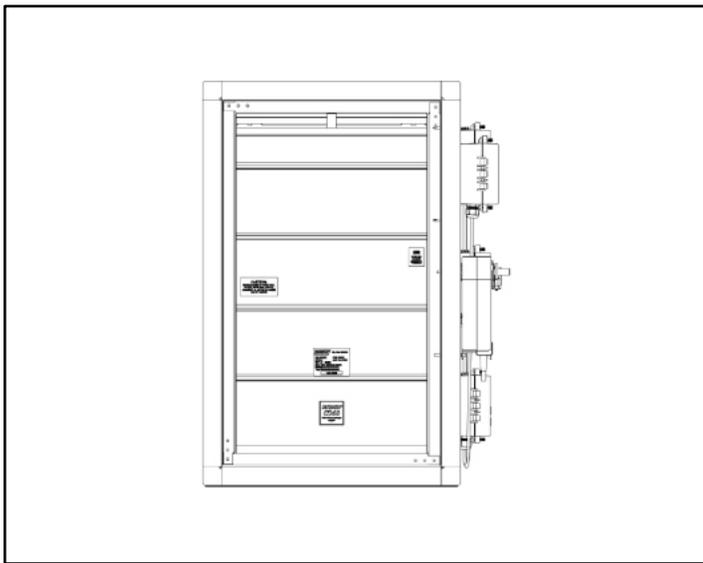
Control Damper mounted within Sleeve. Shown with Optional Rear Flange and viewing from Downstream of the Installation
